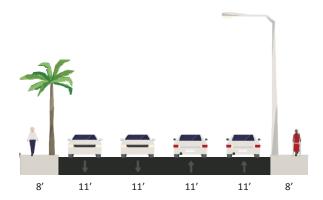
Whiting Street Typical Cross-Section, between Florida Avenue and Marion Street
